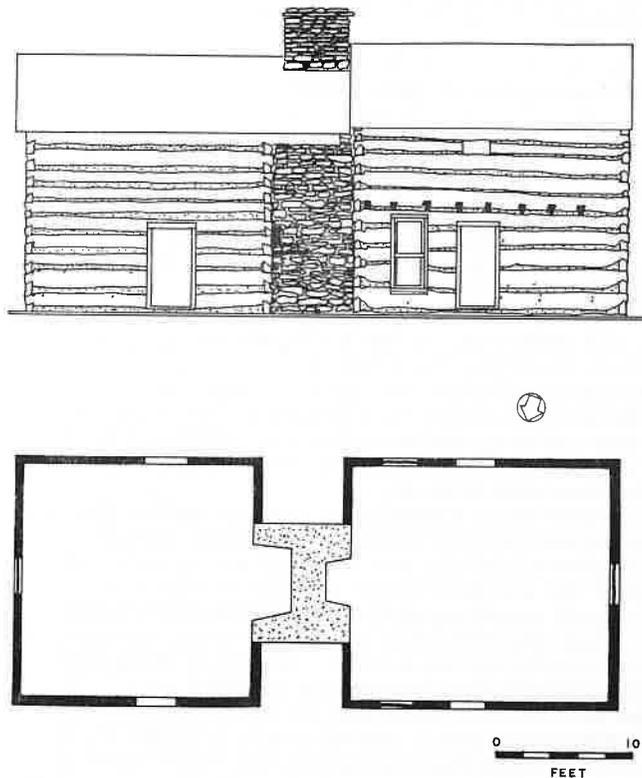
Example of a north elevation and plan. Original drawn at 1/2"=1' scale.
